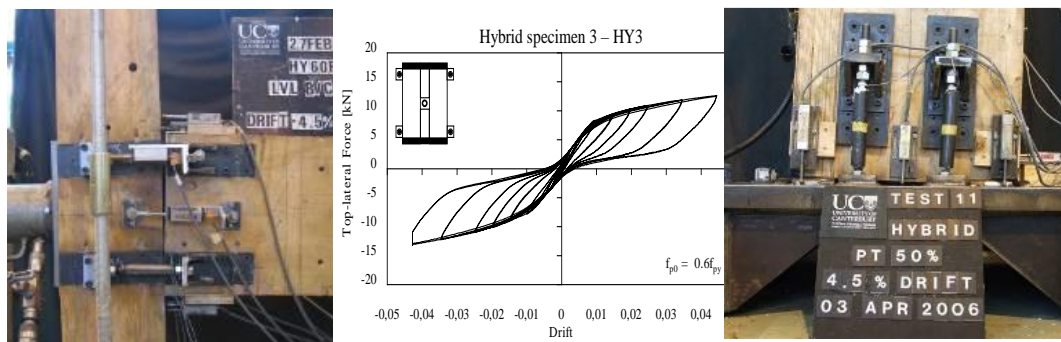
Testing of hybrid post-tensioned timber (Pres-Lam) beam-column joints and column-to-foundation connections (Palermo et al., 2005,2006) and typical flag-shape hysteresis loop.
